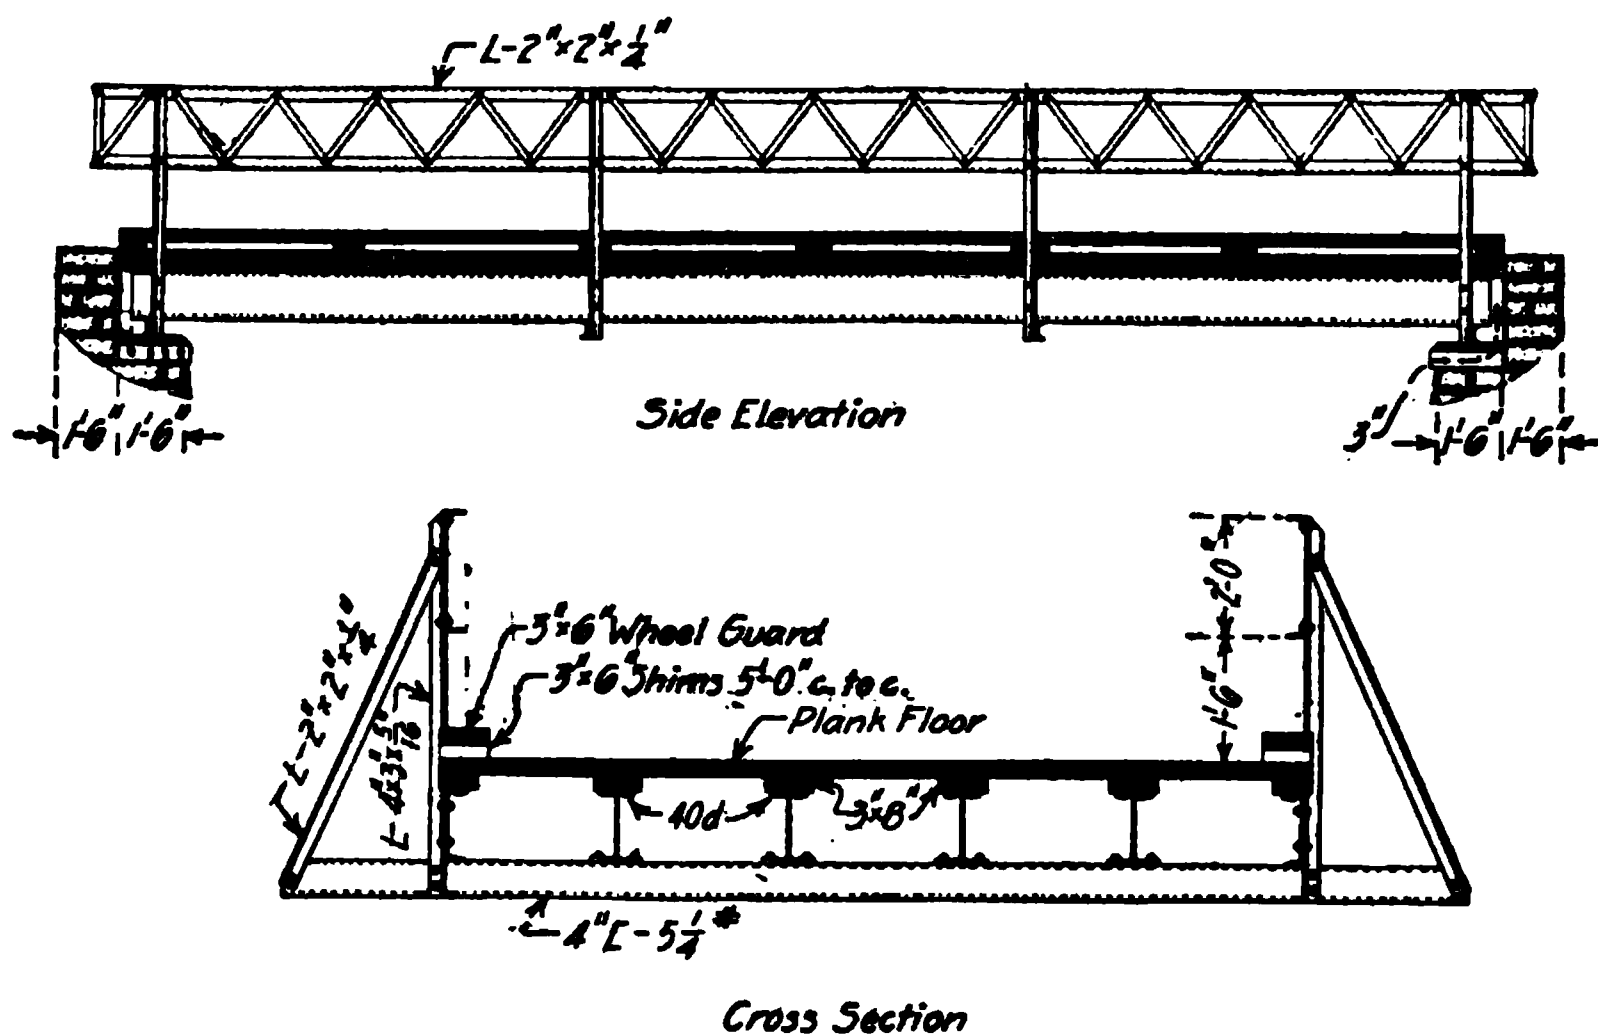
BEAM BRIDGE. (PITTSBURG BRIDGE COMPANY.)
